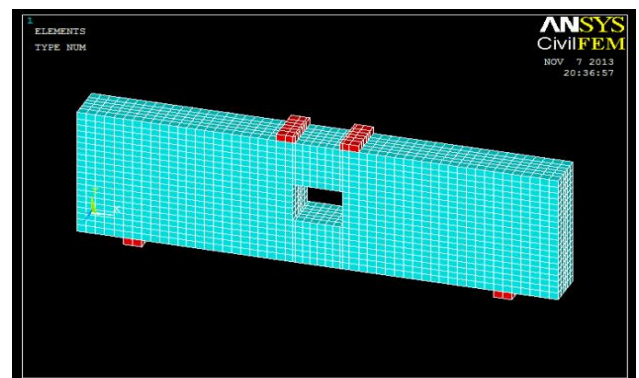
Typical Model for Deep Beam with Opening at Mid-Span Location
